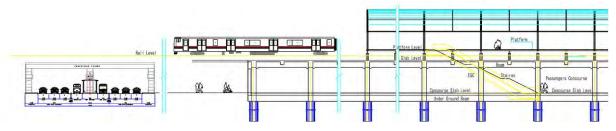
shows the cross section design of Green Line at-grade under the elevated KCR.
